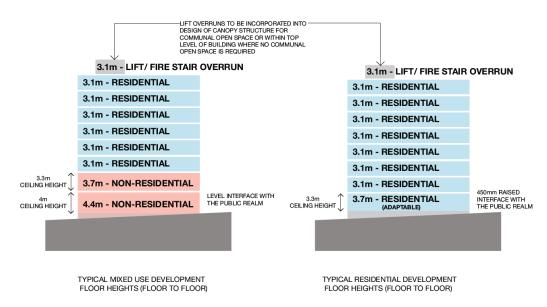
Typical development floor heights (floor to floor) under Concept Proposal showing adherence to ADG requirements for ground and first floors.
